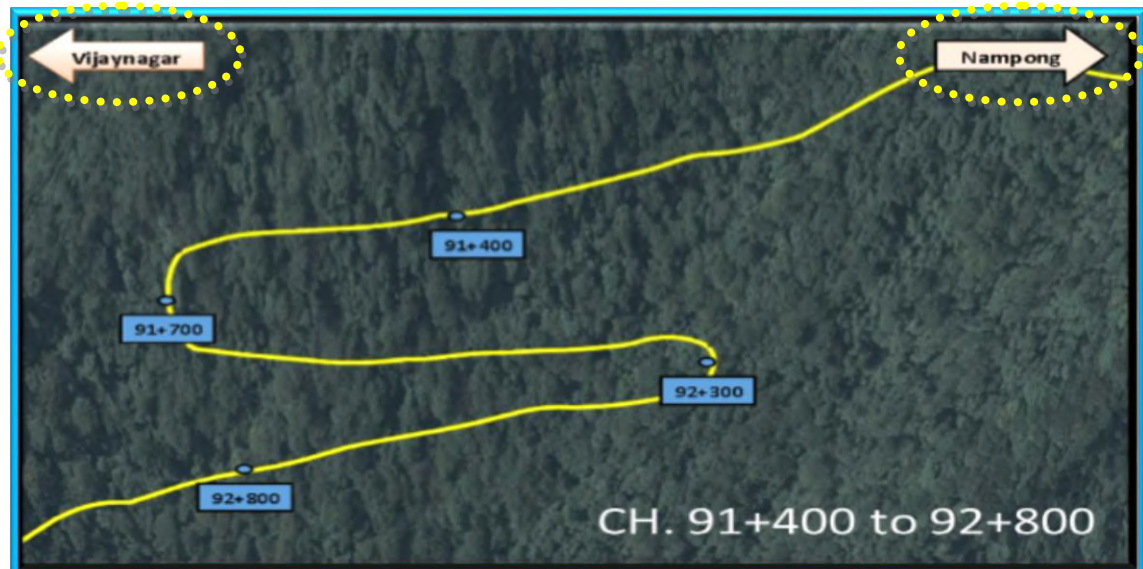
(c): “Hair Pin Zone Portions” in BRO – Nampong to Vijaynagar Roads, for Arunachal Pradesh (CH. 91+400 to 92+800).
